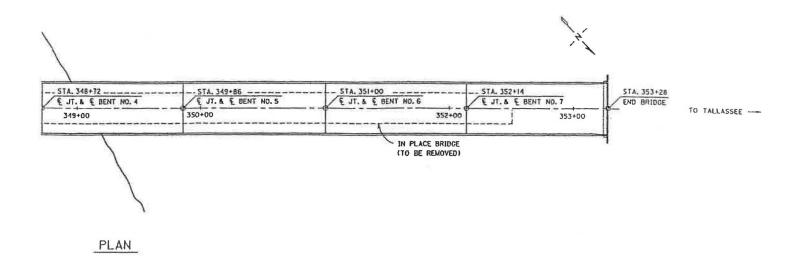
Plan and Elevation Views of the Uphapee Creek Bridge
